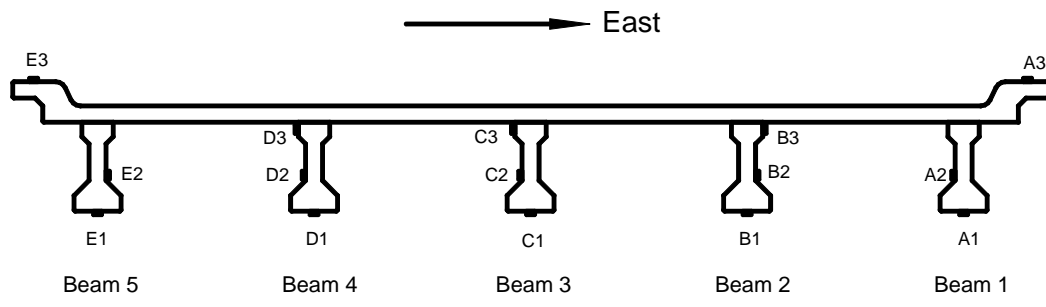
Strain Gage Locations – Lampasas River Bridge – Span 1
